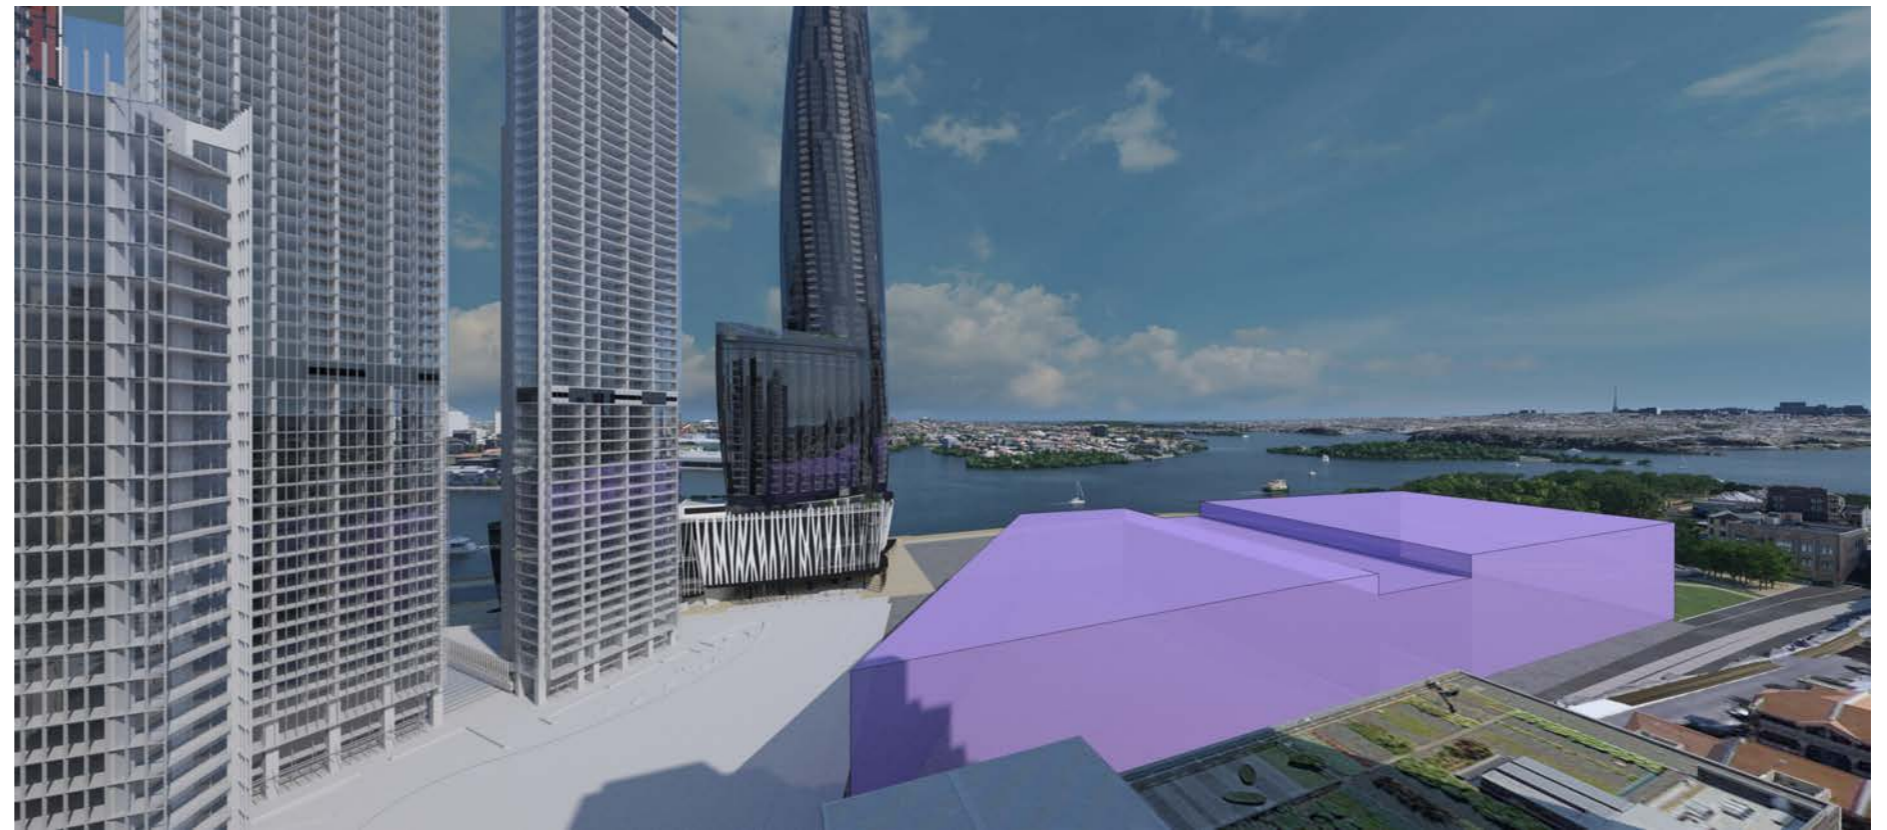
Elevation Looking East - MOD 9 with the Approved Concept Plan shown in light blue outline (Source: Modified from HASSELL diagrams (October 2020))
